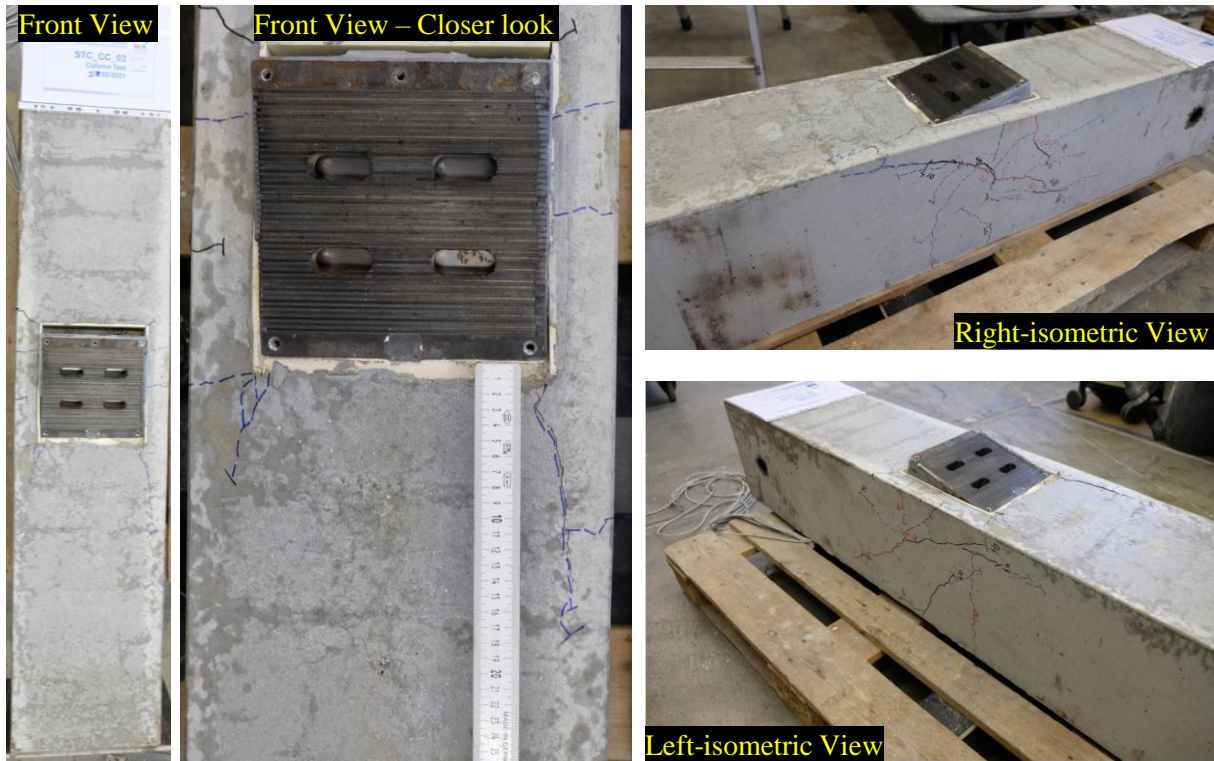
Crack patterns after the disassembly of the test set-up / CC-03.
